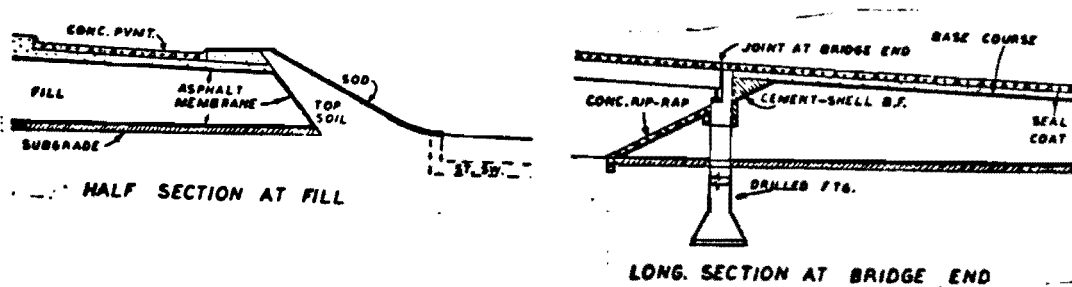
Typical embankment sections with envelope-type membranes, Gulf Freeway (from Ref 28).
